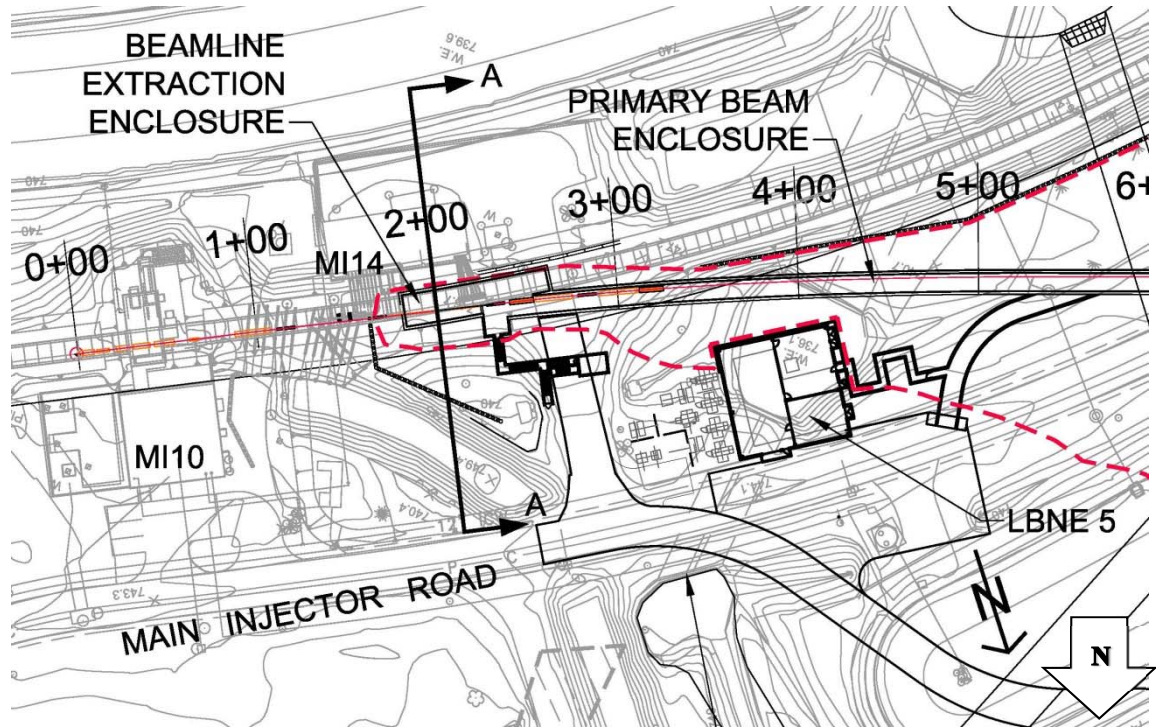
Beamline Extraction Enclosure and Primary Beam Enclosure with Section A-A cut shown to show location of section shown in Figure 5-4.
